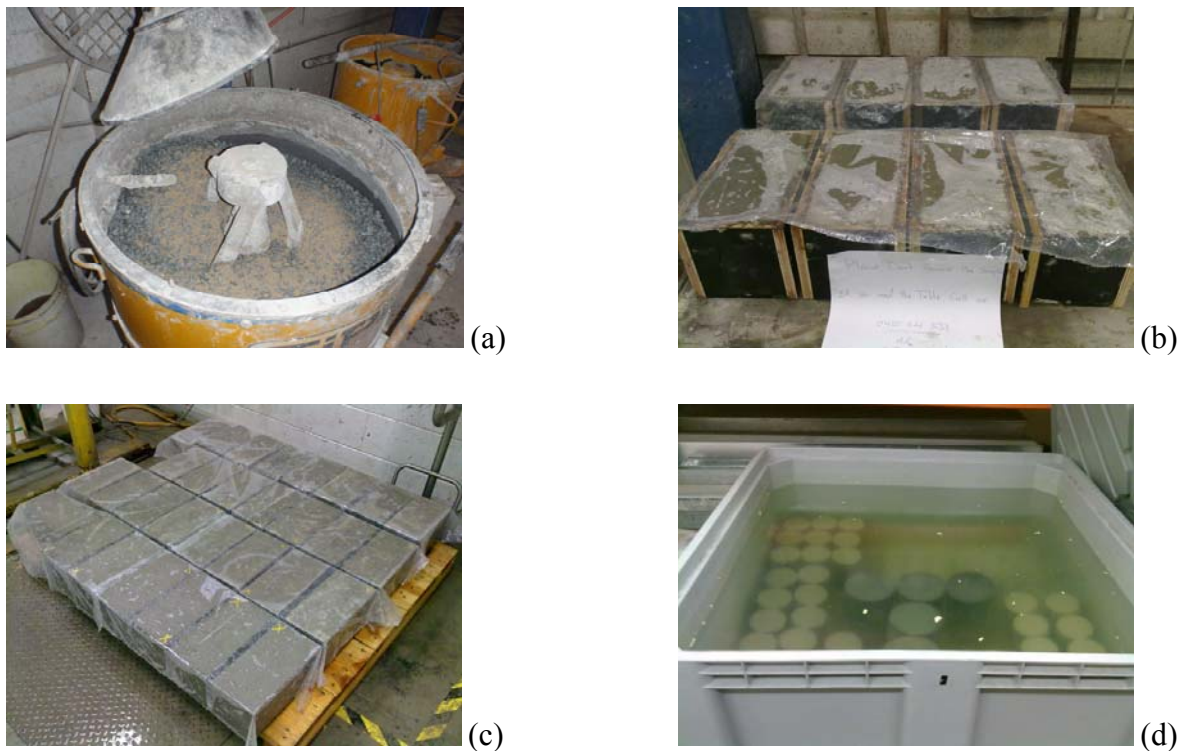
Casting of the concrete samples, (a) mixing, (b) placing the concrete inside the wooden moulds, (c) curing under plastic sheets, and (d) curing of the concrete cylinders.
